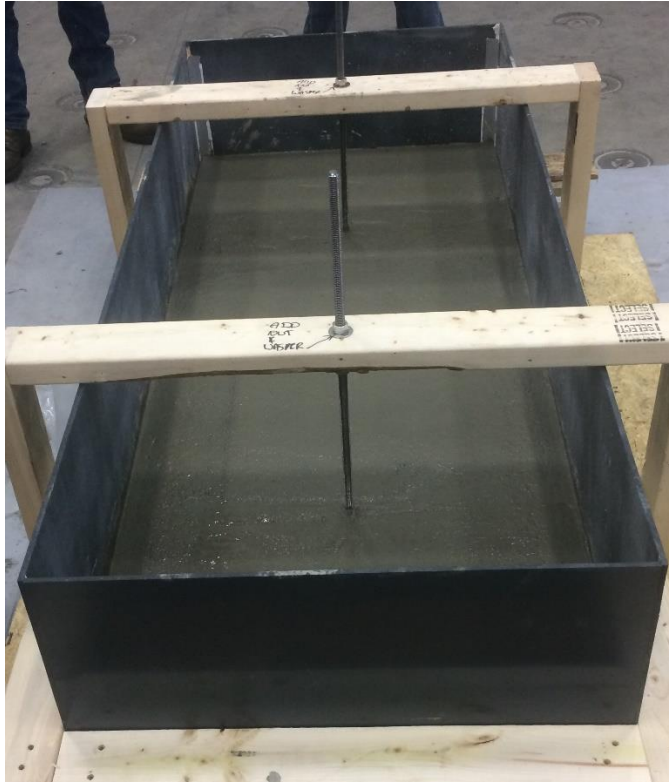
Box breakwater during construction, concrete layer poured. Wooden framework to keep it square and support the threaded rods that would function as lifting points.
